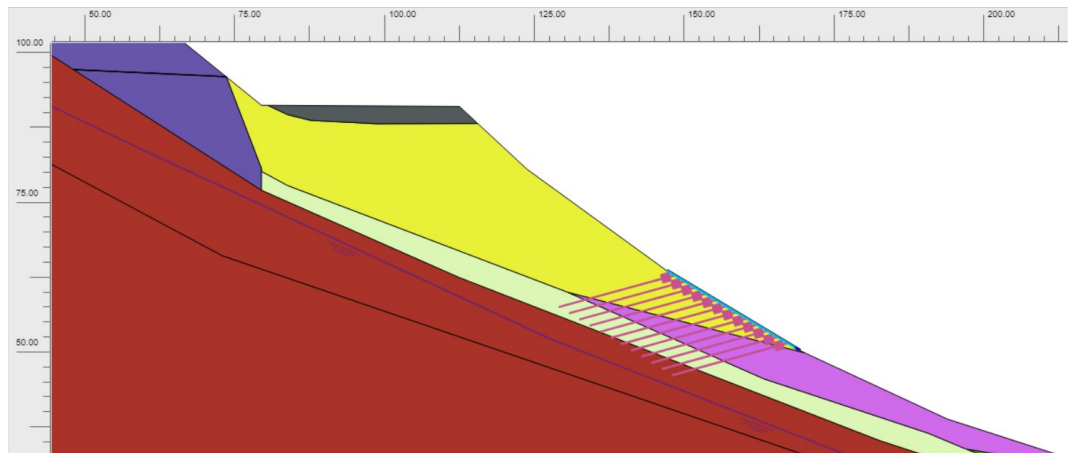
Soil Nail layout with 2.0m spacing and 15 degree inclination
